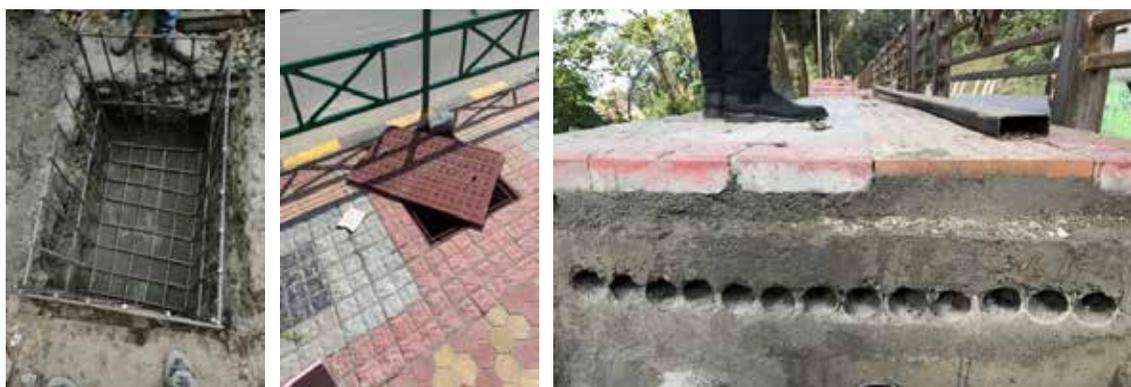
Manhole construction (left) & executed section with HDPE pipes (right)
